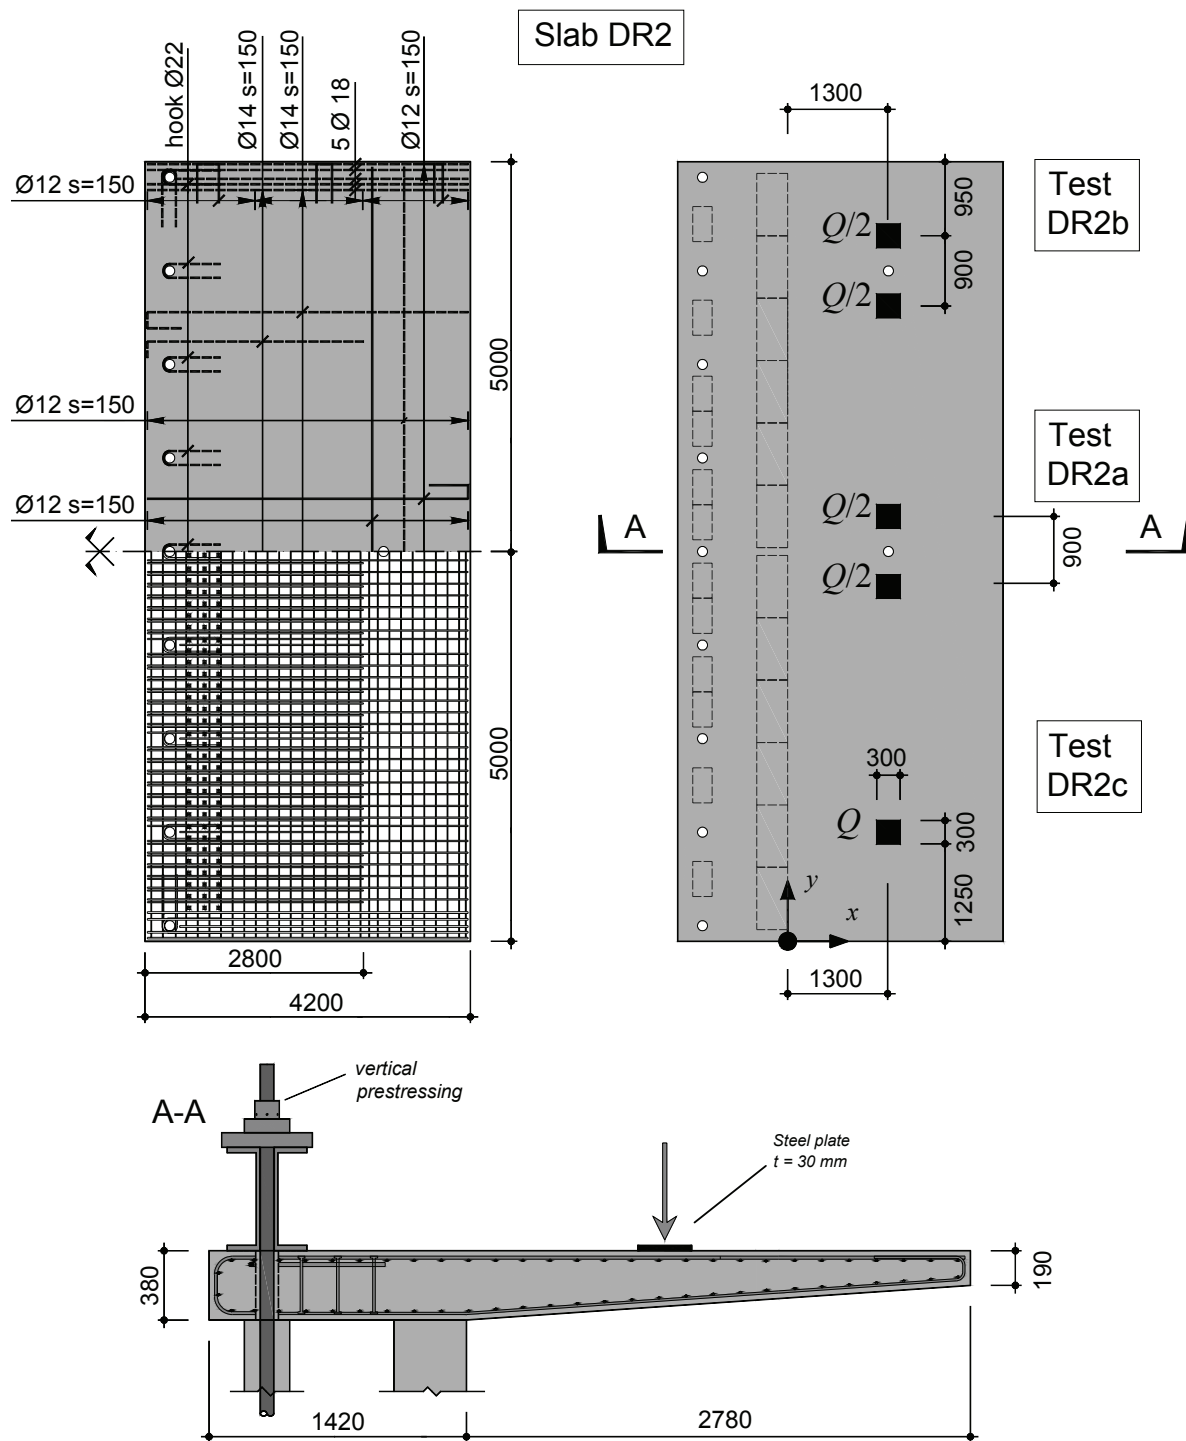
Slab DR2. Dimensions, reinforcement layout and applied loads [mm]
